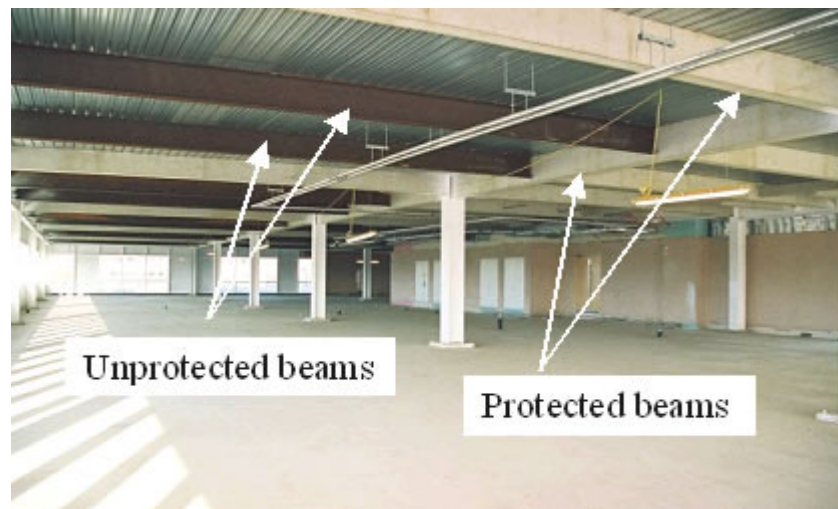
Example showing unprotected and protected beams by using membrane action in the composite floor slab.
